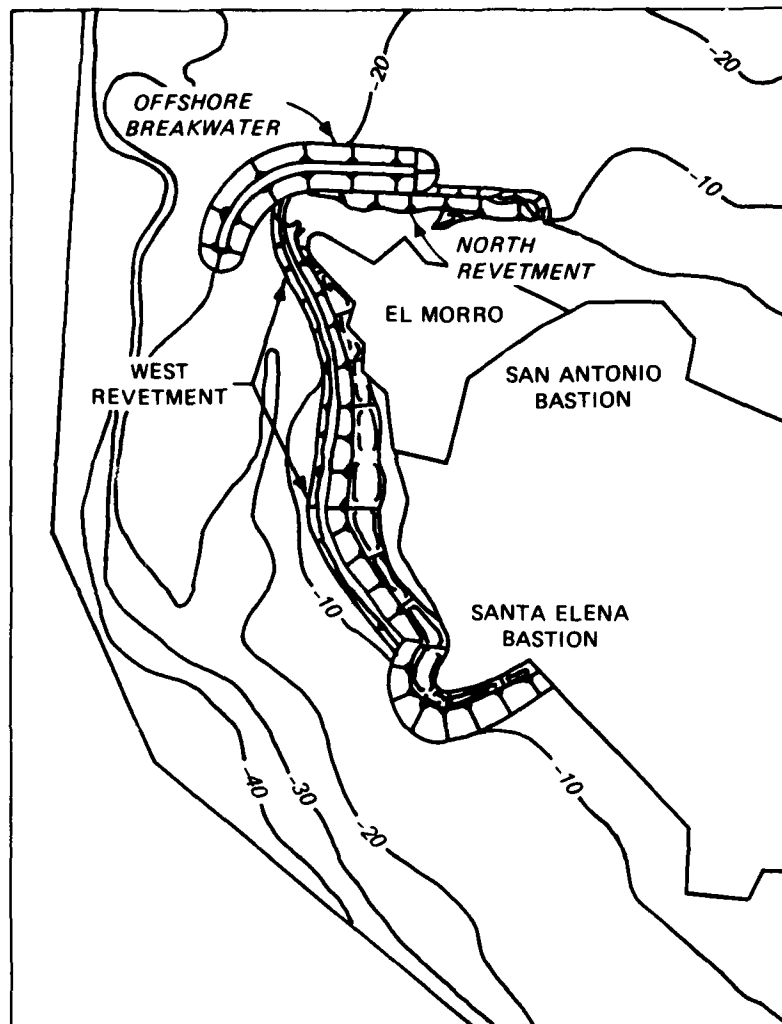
Proposed protective structures: offshore breakwater, north revetment, and west revetment
